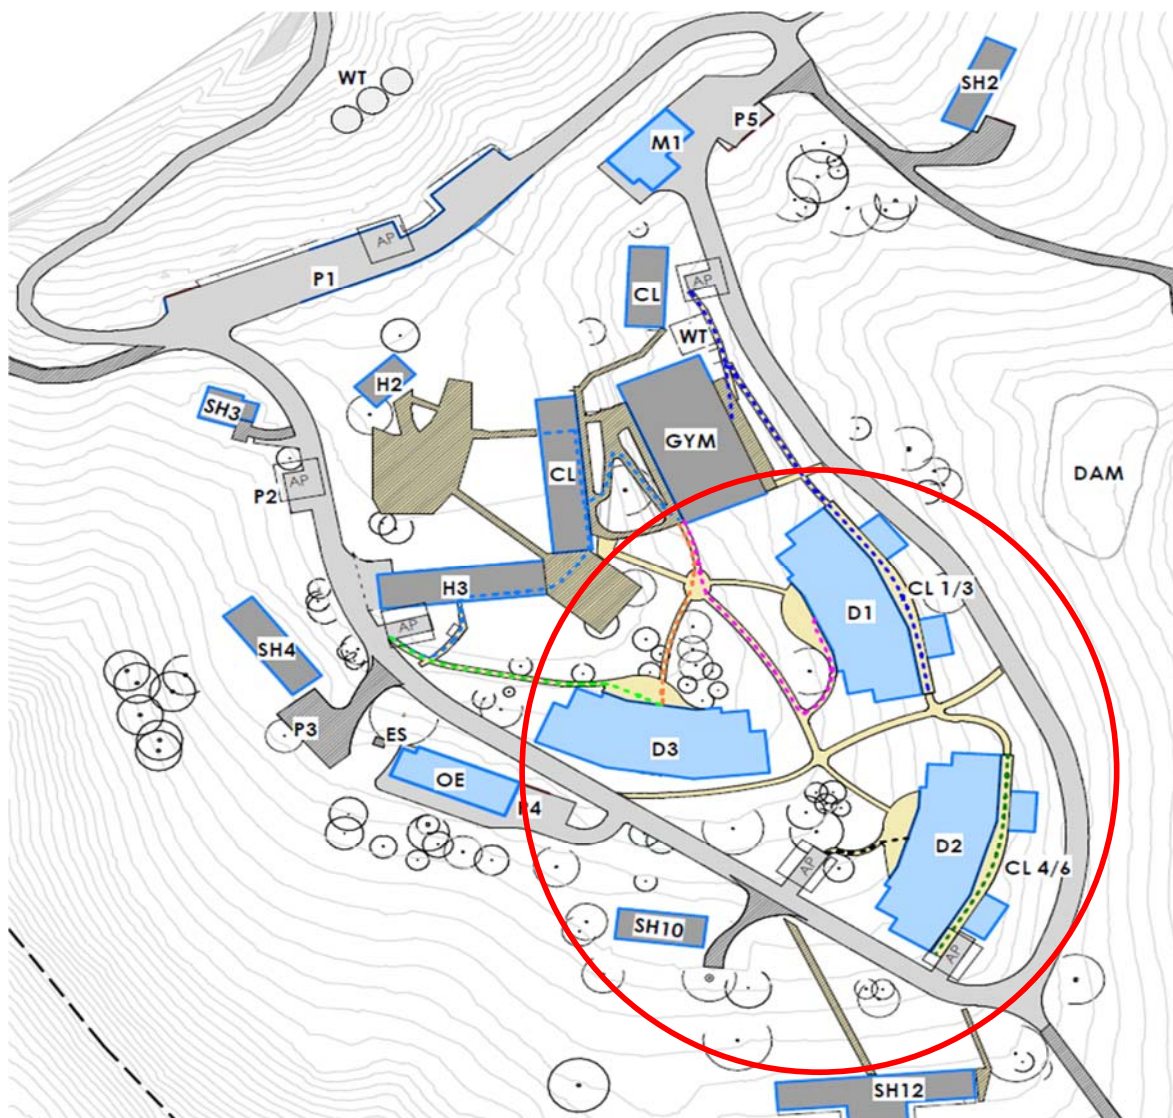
Plate 1: Site Plan: Proposed new dormitories and classrooms (circled in red).
